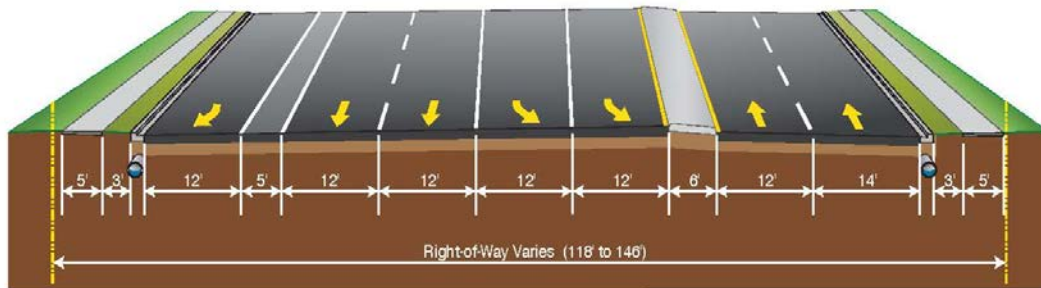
2 Existing Typical Section from Babcock Street to Enterprise Ave
